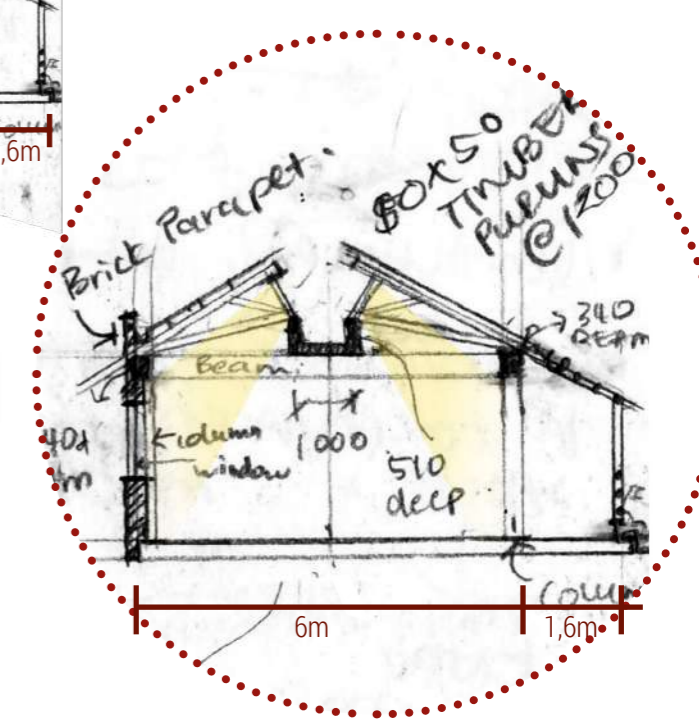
Top left, page 117: Considering solar angles in roof form (Author 2021).
